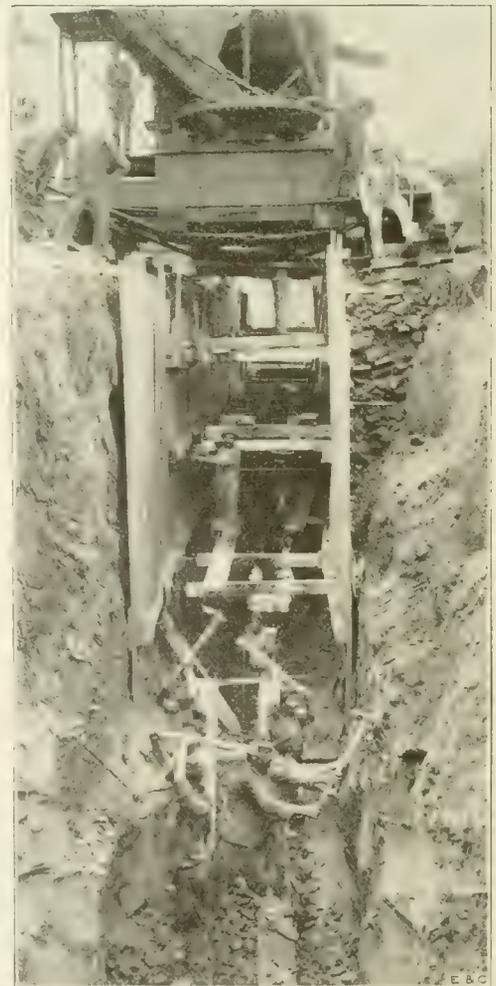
View Showing Excavating and Timbering Methods, North Shore Intercepting Sewer.
